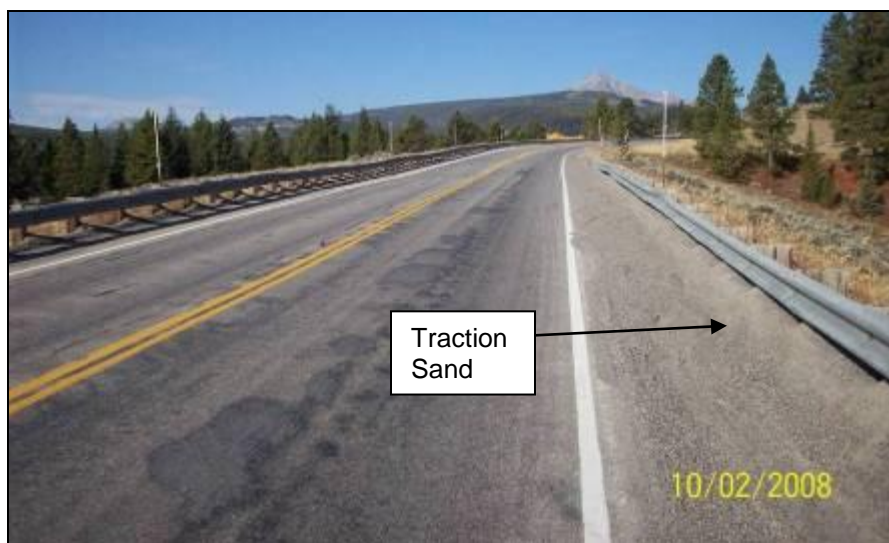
Assessment crossing C12 (North Fork West Fork Gallatin River) showing typical build up of traction sand adjacent to a guardrail along Highway 64.
